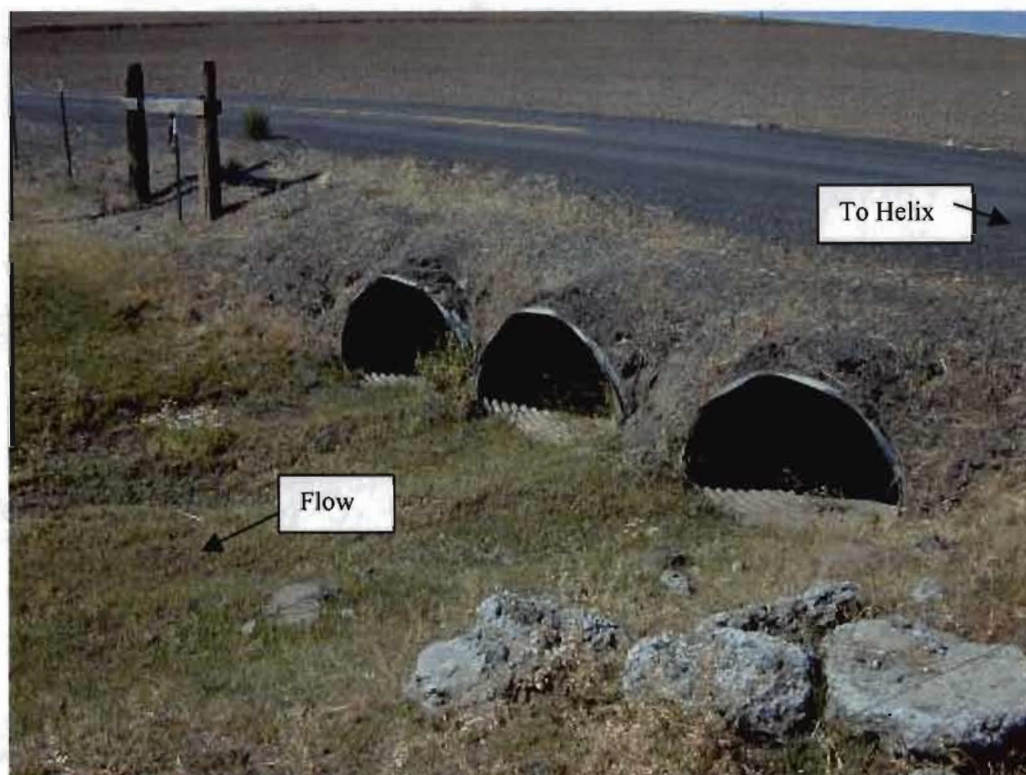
View looks at downstream end of culverts under county road to Helix.
